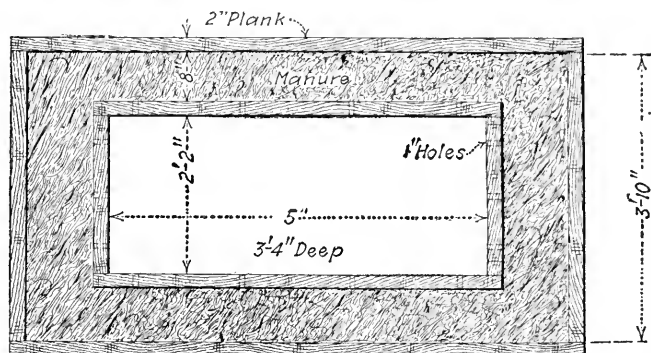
HORIZONTAL SECTION THROUGH MANURE-WARMED THAWING BOX.
